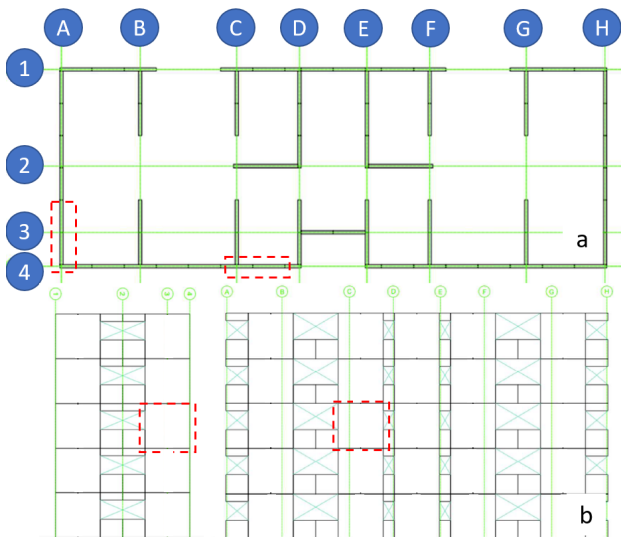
CLT shear wall distribution in (a) plan and (b) elevation (along A-A and I-I).
